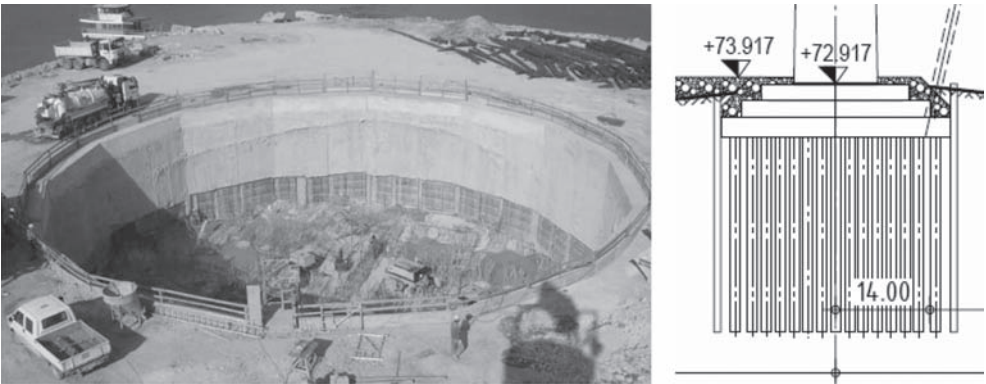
Tower foundation, construction pit with 35 m diameter, slot wall and top end of bored piles.
